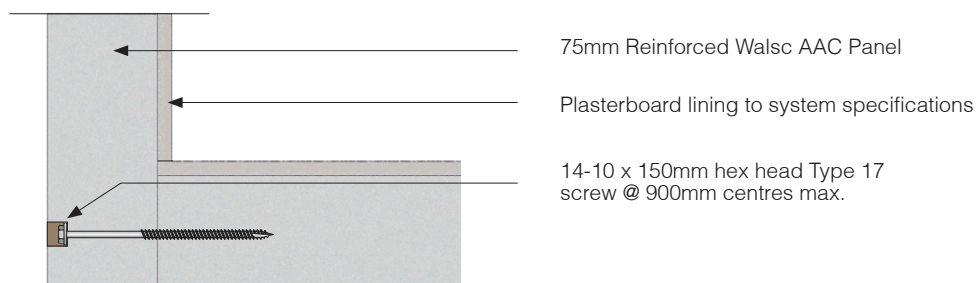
Service Shaft Wall Option 1 Corner Fixed Joint Detail
